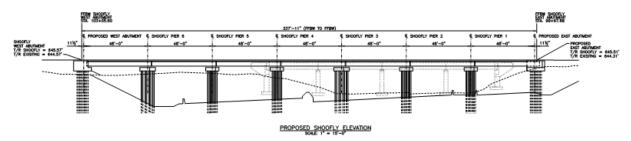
Proposed 7 Span Temporary Shoofly Bridge
